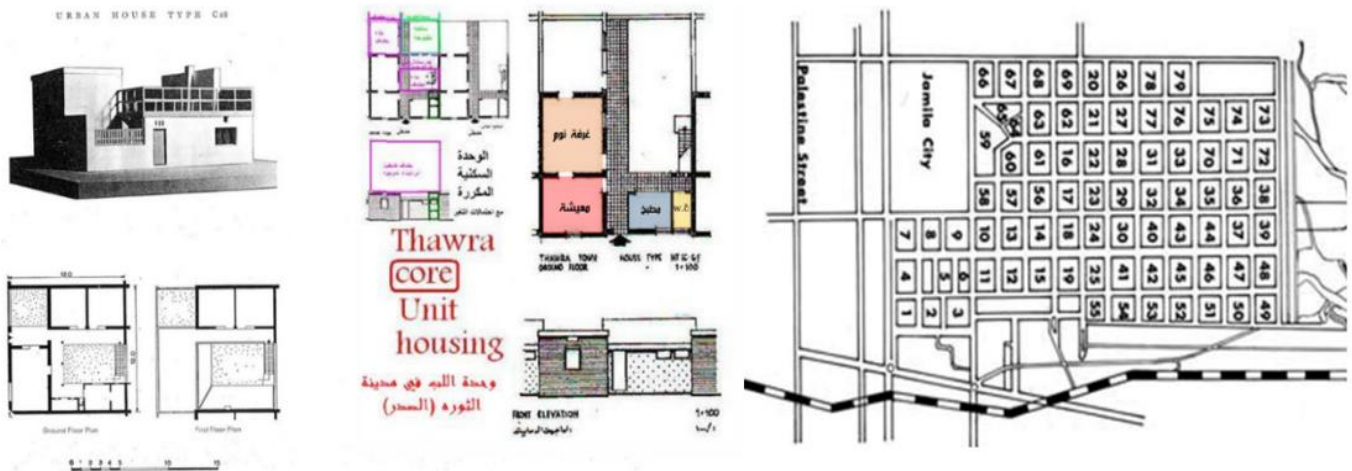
The layout of a single sector in Sadr City and the proposed plan for residential units. Source: Pyla, Panayioti. "Back to the Future Doxiadis's Plans for Baghdad." *Journal of Planning History* 7, no. 1 (2008): 3-19.
